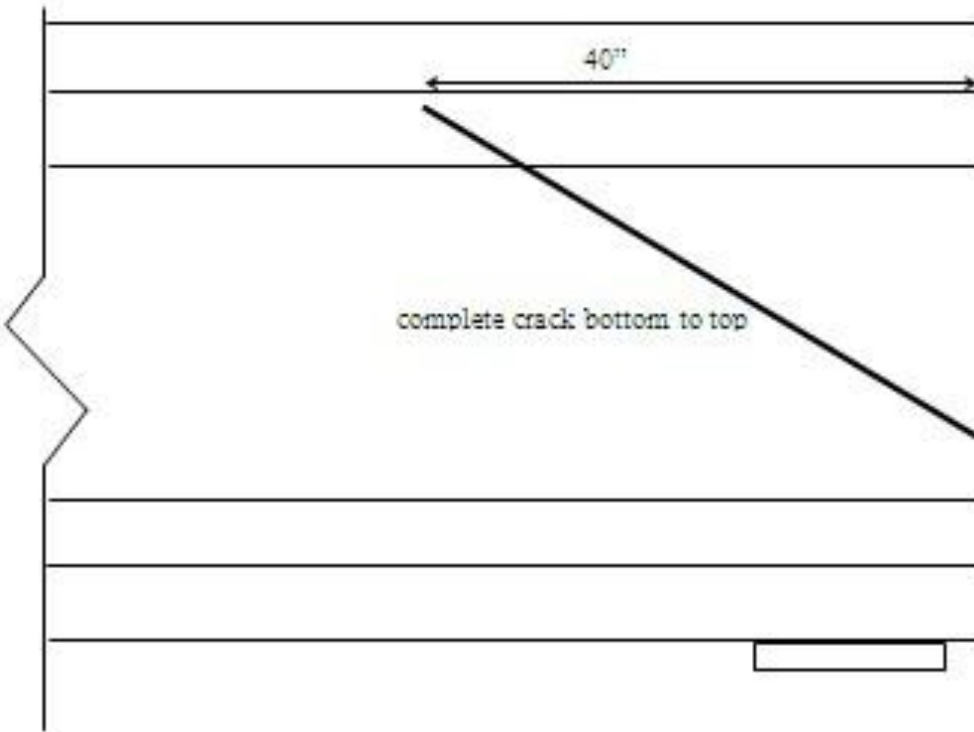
Crack diagram for girder 4th from east side, east face, north abutment (#1829).
